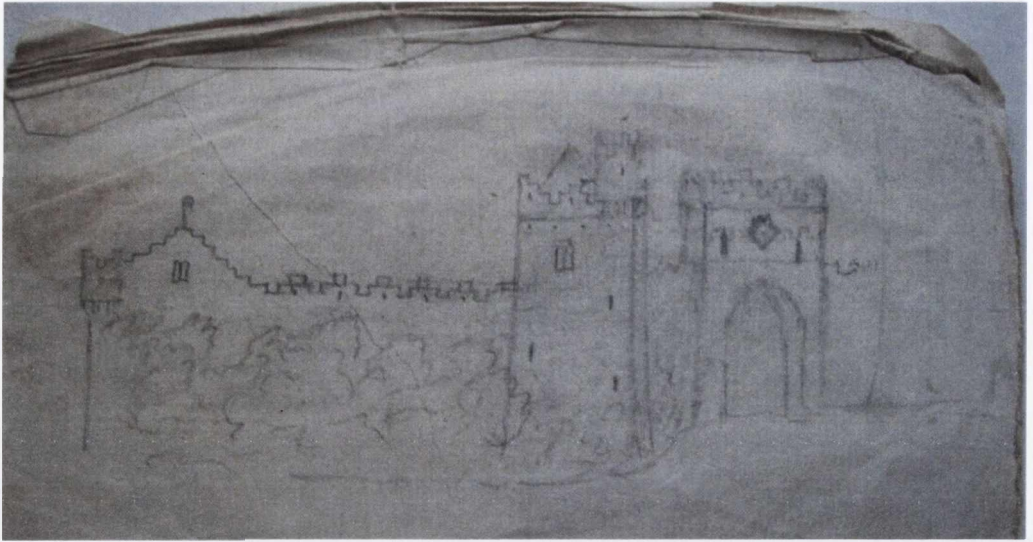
Sketch of proposed gateway with tower house, Laurence Parsons, [1801–1803], Sketch notebook, f.12r.
